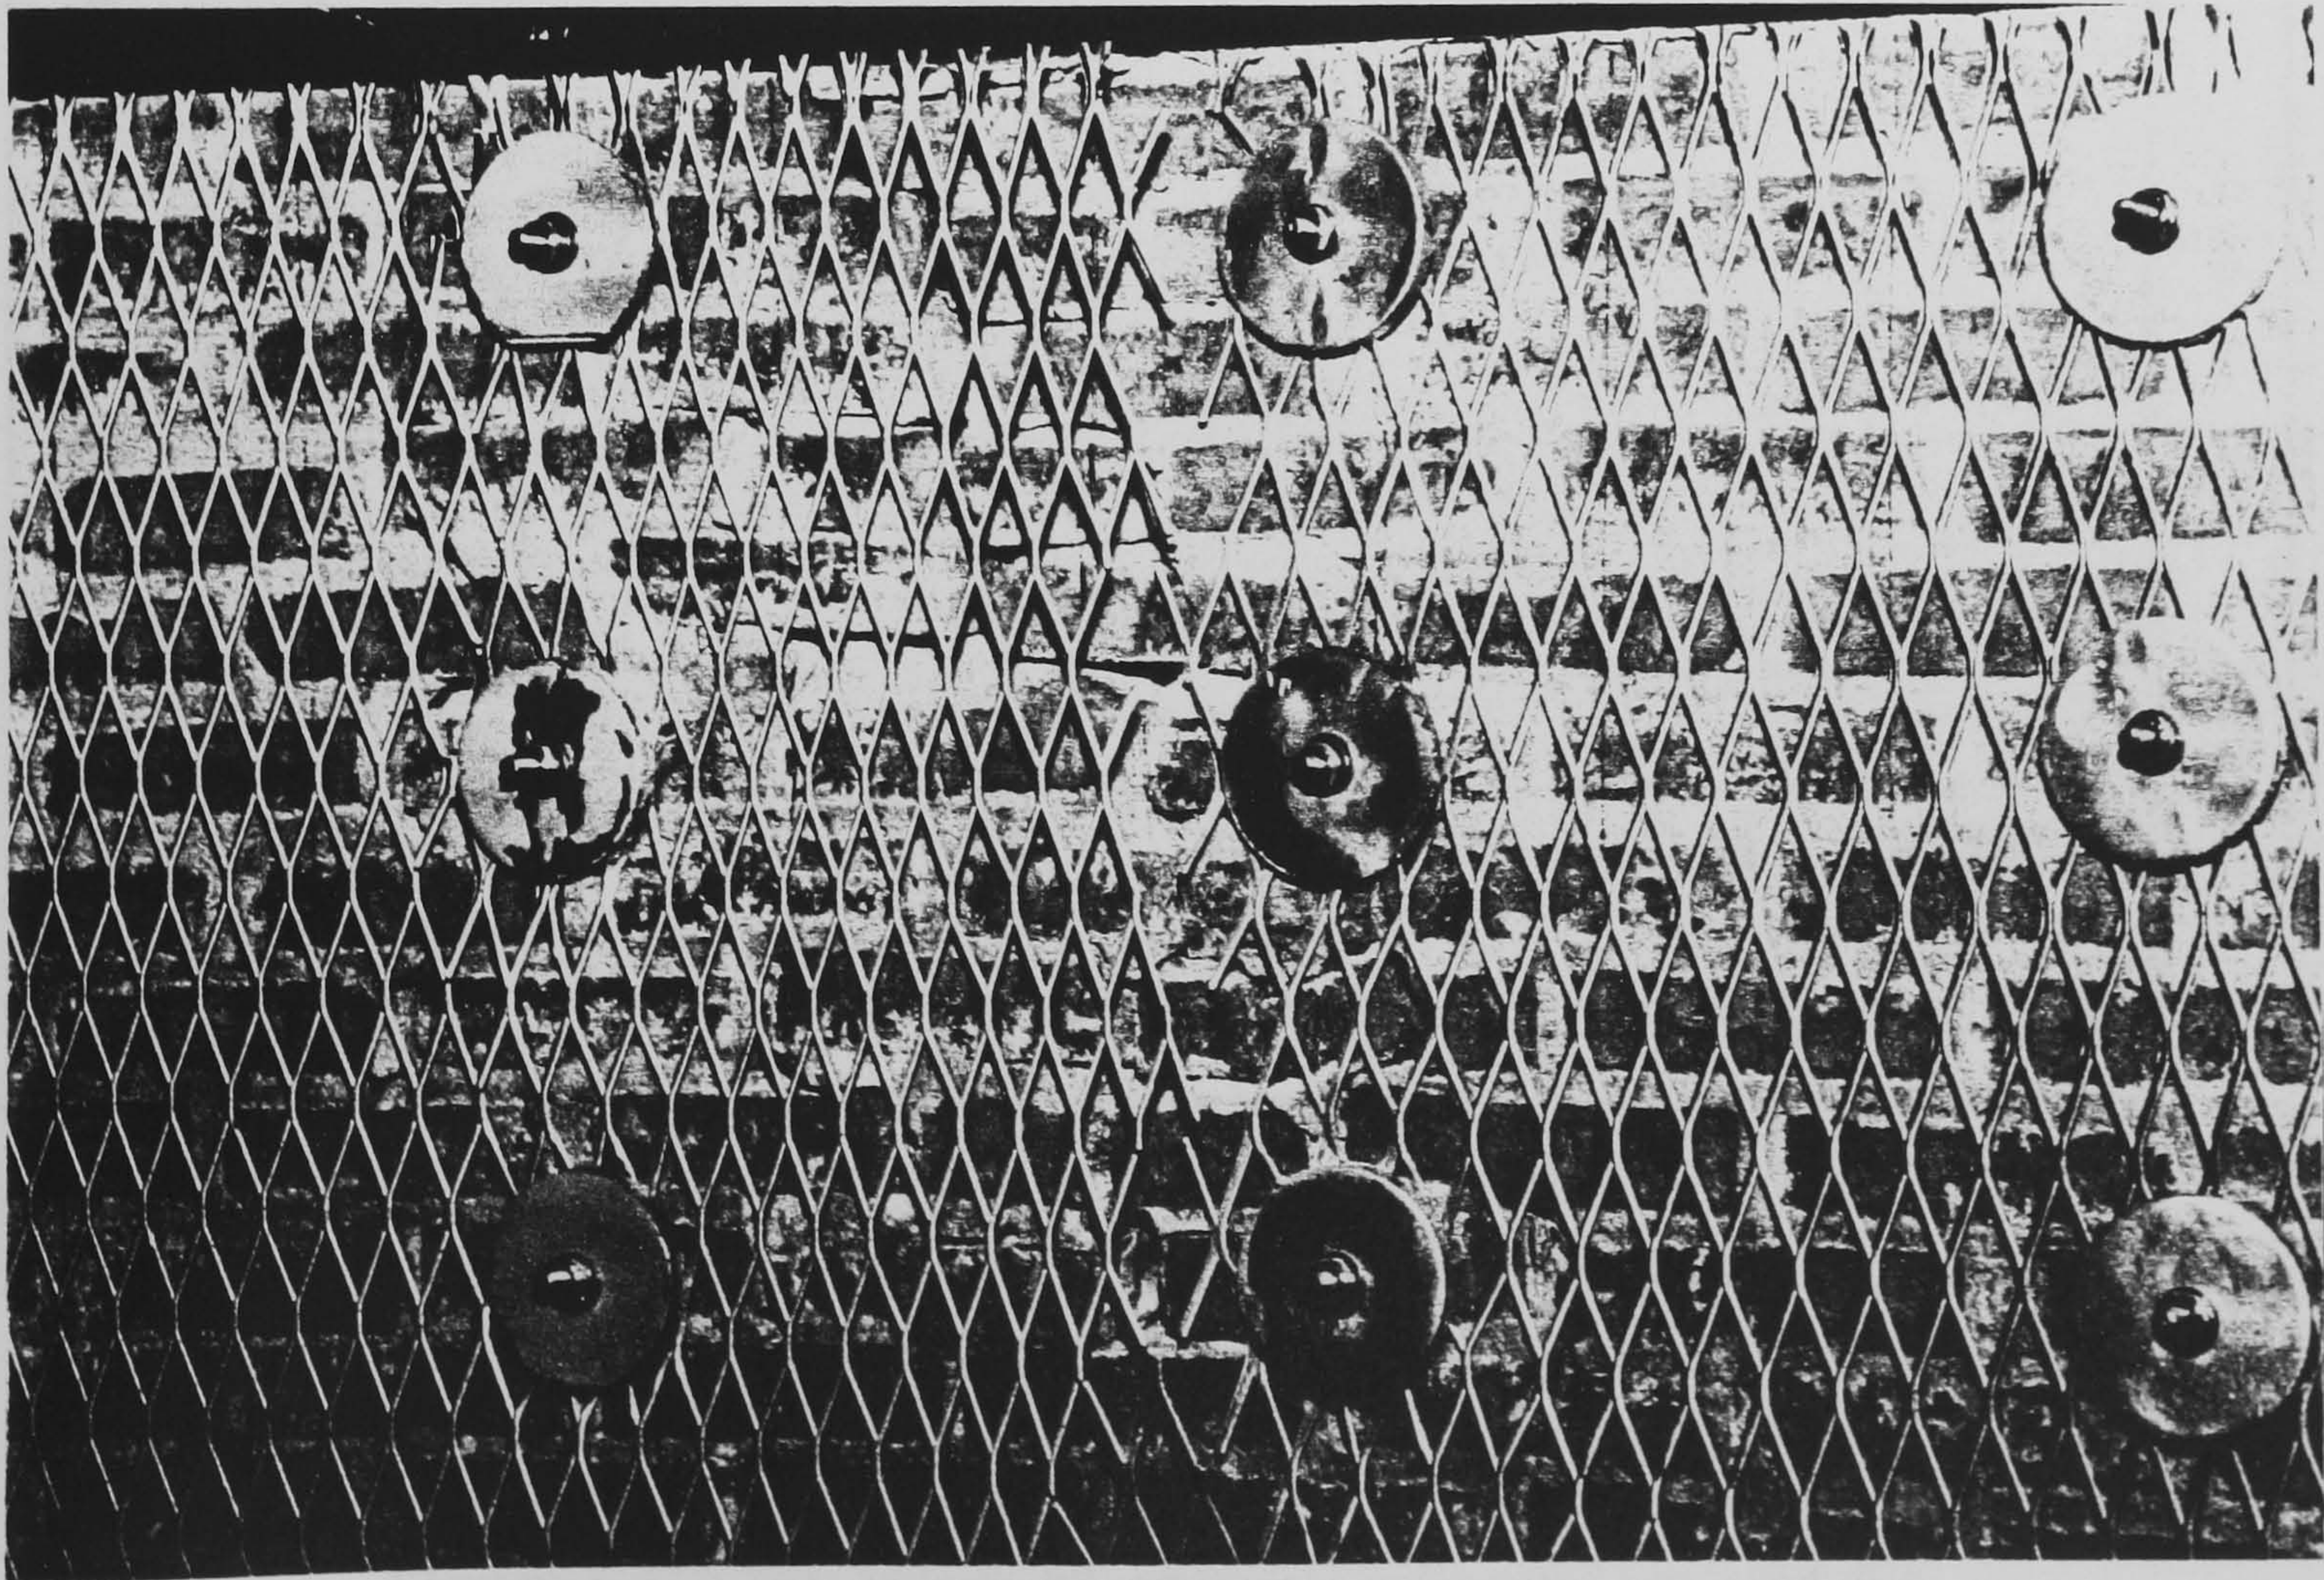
Tensile failure of wire mesh reinforcement (wall-M)
